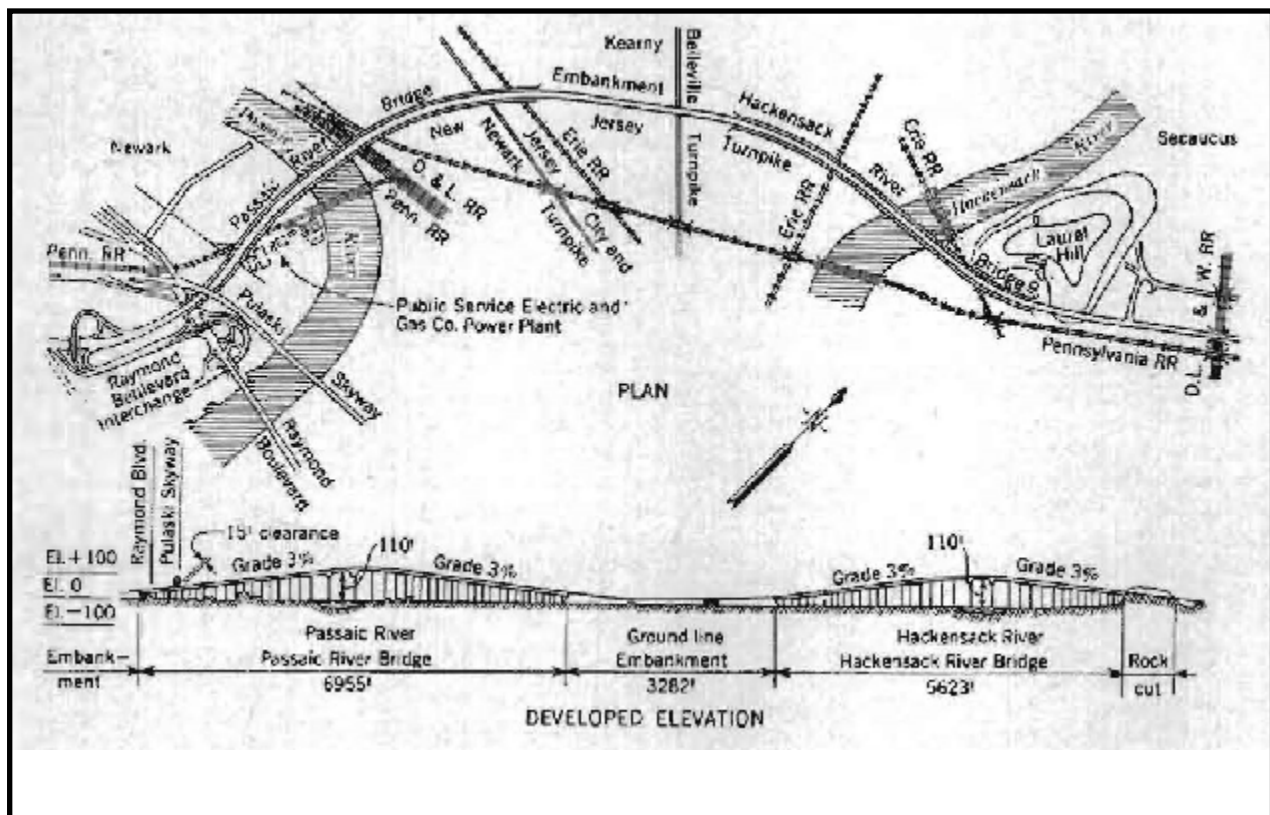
1952 plan and elevation of Passaic River and Hackensack River Bridges indicating the comparative complexities with the Newark Bay Bridge alignment (Ammann 1952: 61).
